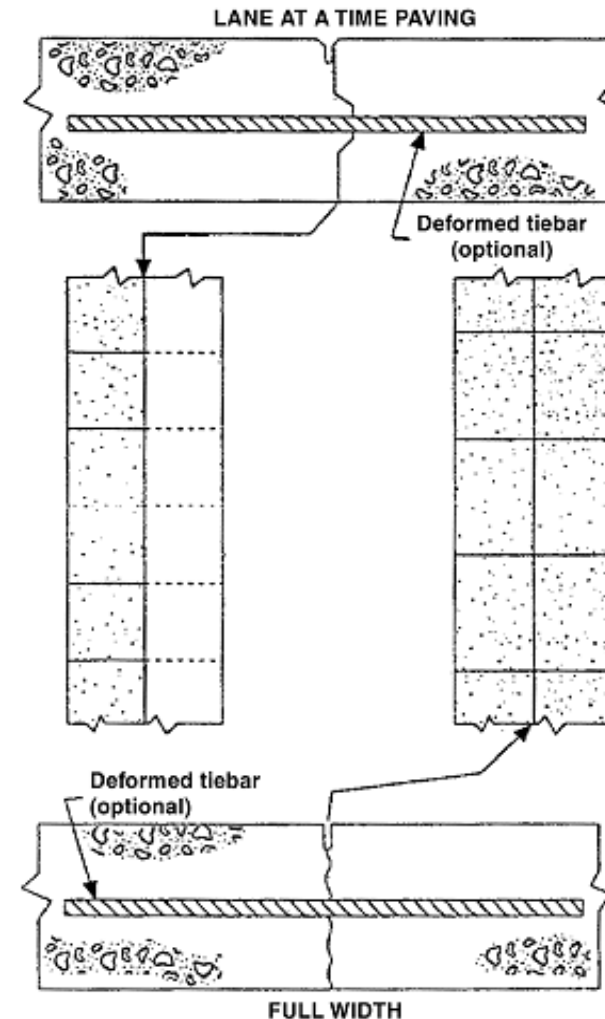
Longitudinal joints.³³ (Note: use butt joint with tie bar for pavements 150 mm [6 in.] thick or less.)
